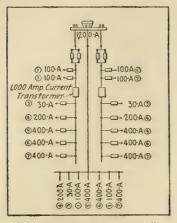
Panel for cabinet "A." Electrical engineer's sketch included in specifications. See Fig. 535 for shop drawing.
